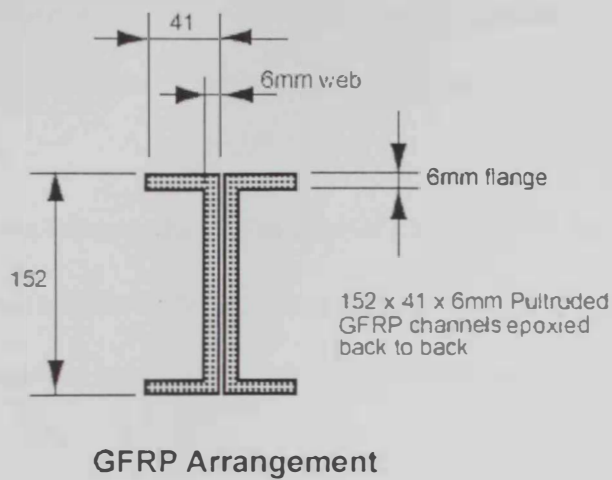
Cross sectional detail of GFRP beam for all test beams
